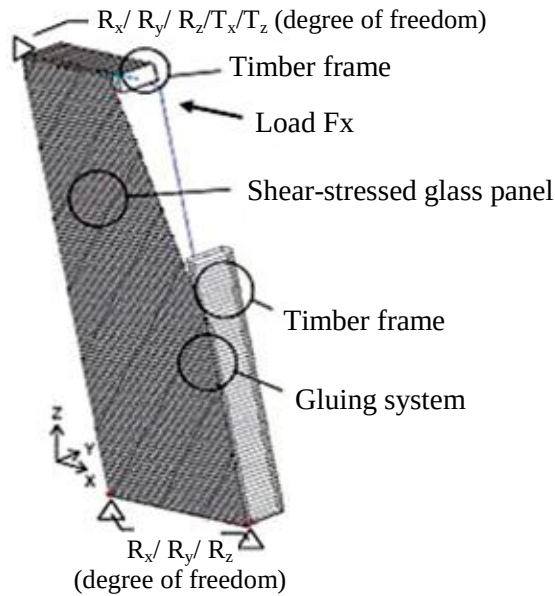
Model of a stiffening timber-glass-construction [26]
